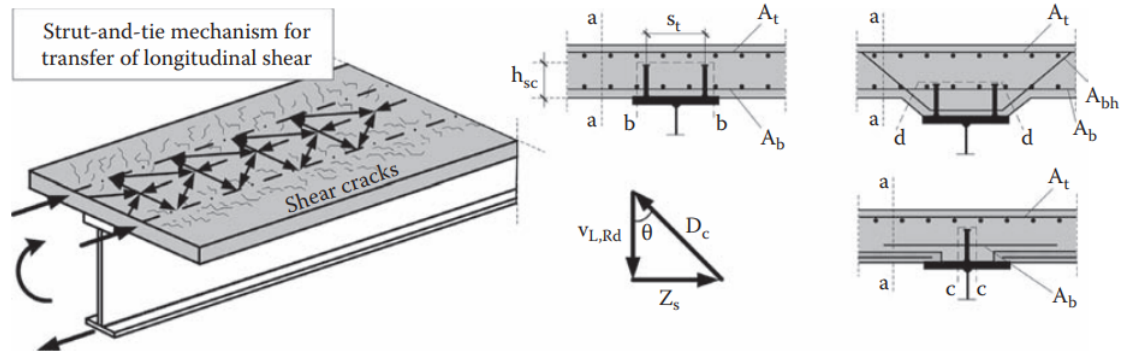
Failure modes due to longitudinal shear for the concrete slab (Vayas & Iliopoulos, 2013)
